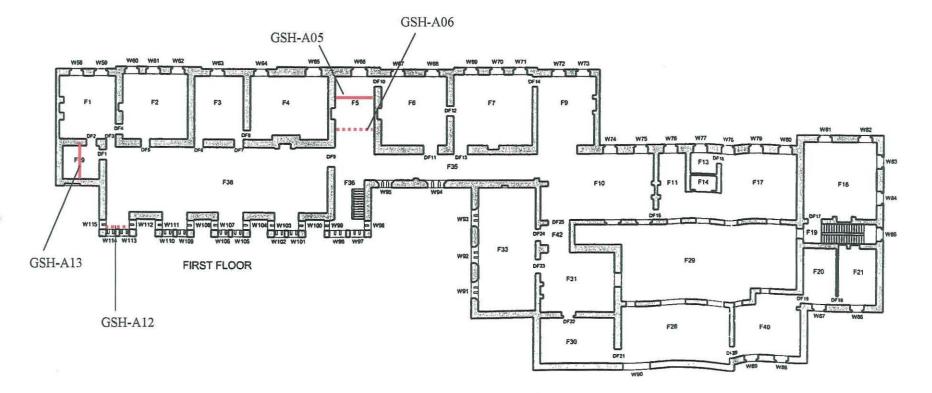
Gibside Hall - First-floor plan, showing the location of samples GSH-A05-A06 and GSH-A12-A13 (after Waring & Netts Chartered Architects Construction Consultants)
